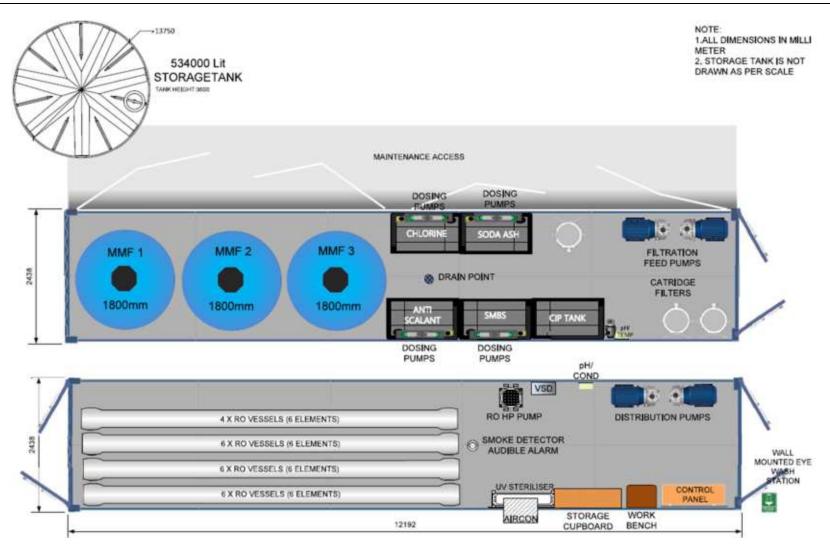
Arrangement of containers for 93 m³/hr RO containerised plant
